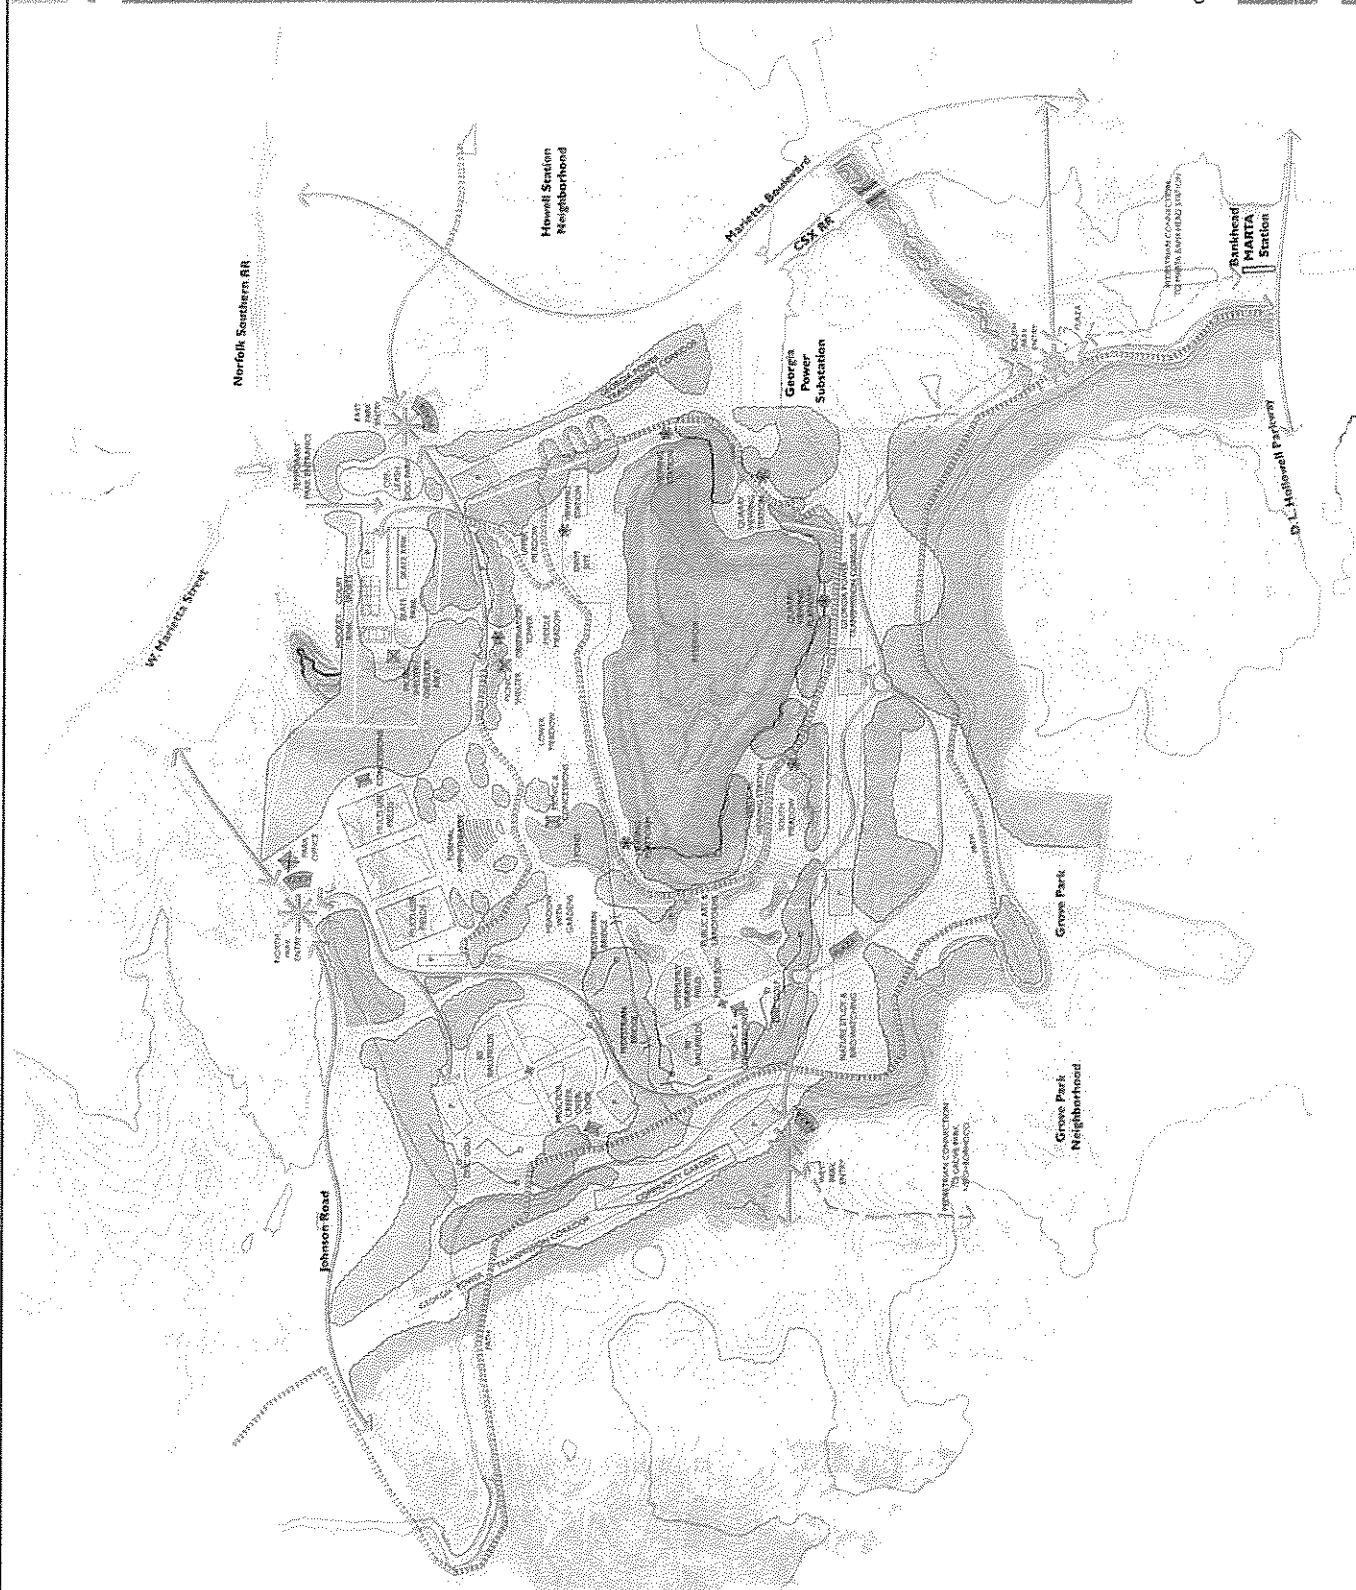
Westside Reservoir Park Master Plan Scheme
